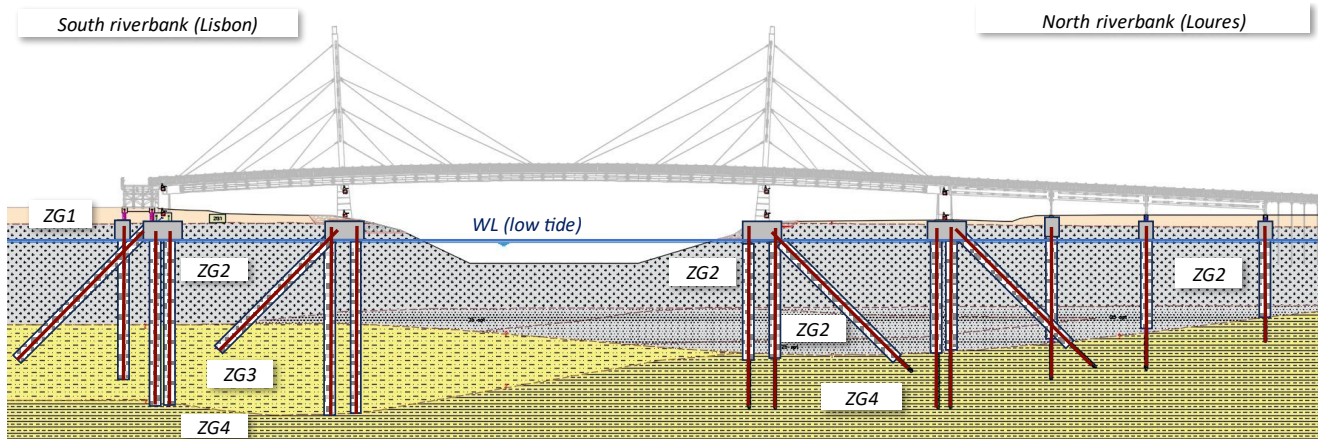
Bridge elevation with geotechnical zones (JETSj project, without a scale).
